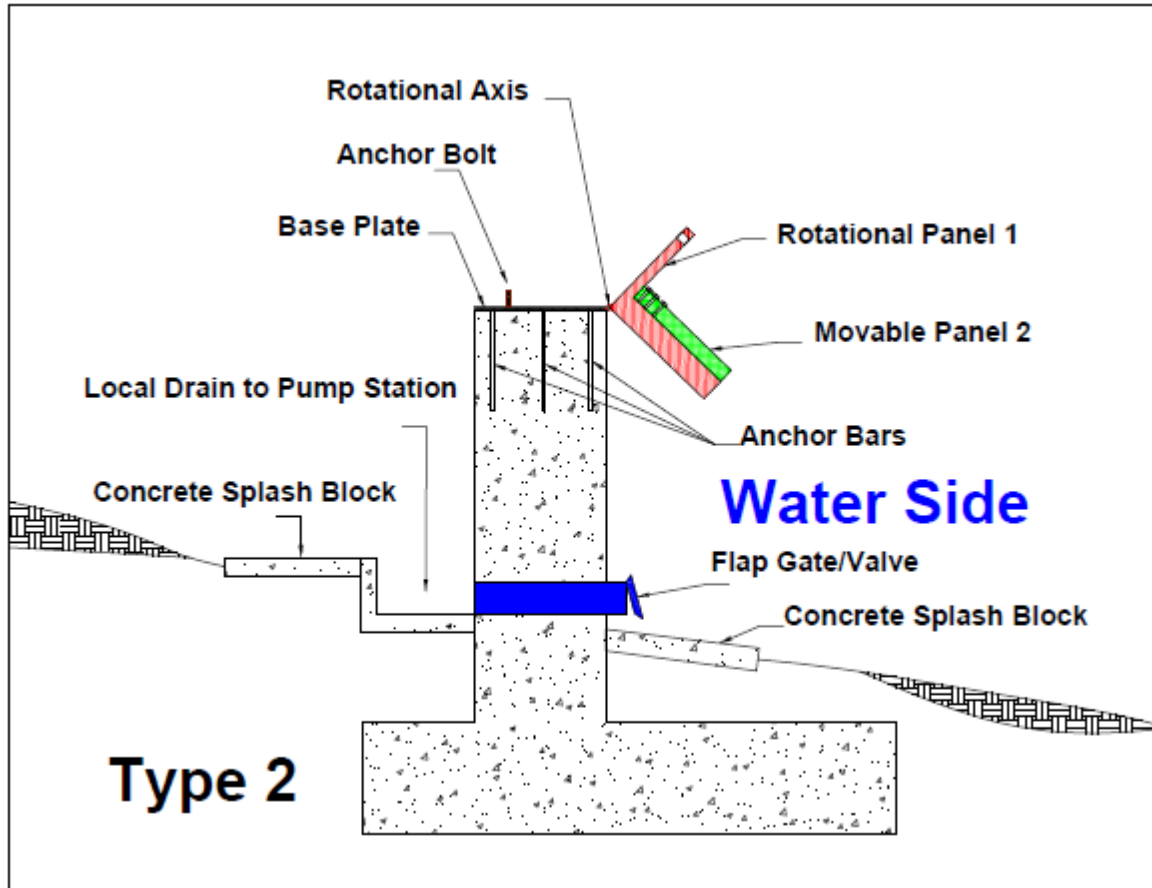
Illustration of Concrete Floodwall with Movable or Removable Panels.
